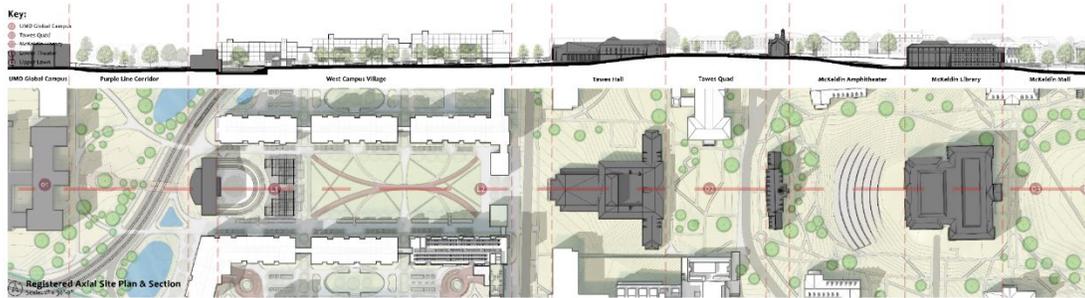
Register Axial Site Plan & Section - West Campus Village. Drawn by Author
